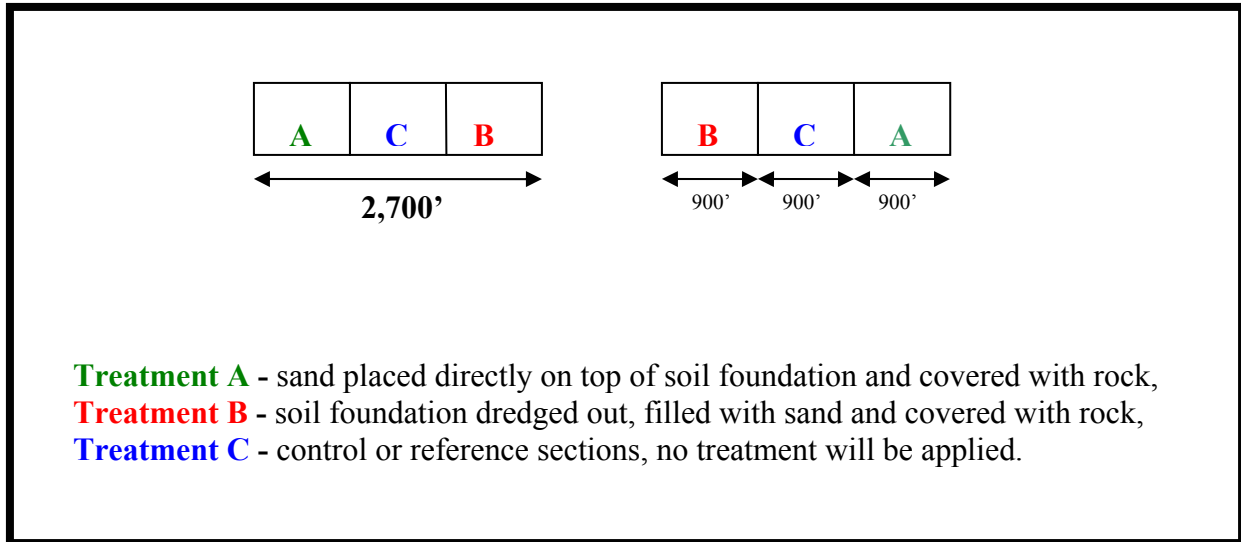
Shoreline protection foundation improvement demonstration (LA-06) layout and treatment regime.
